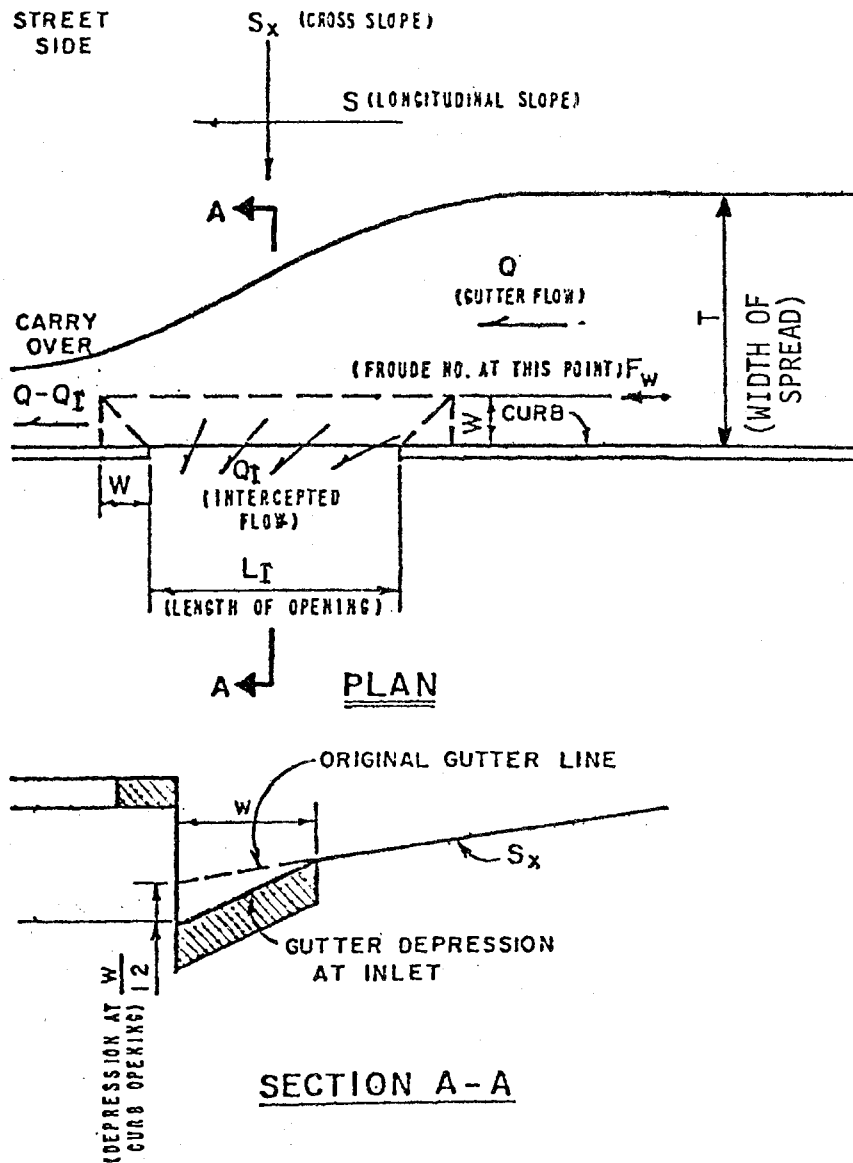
FHWA Depressed Curb Opening Inlet
